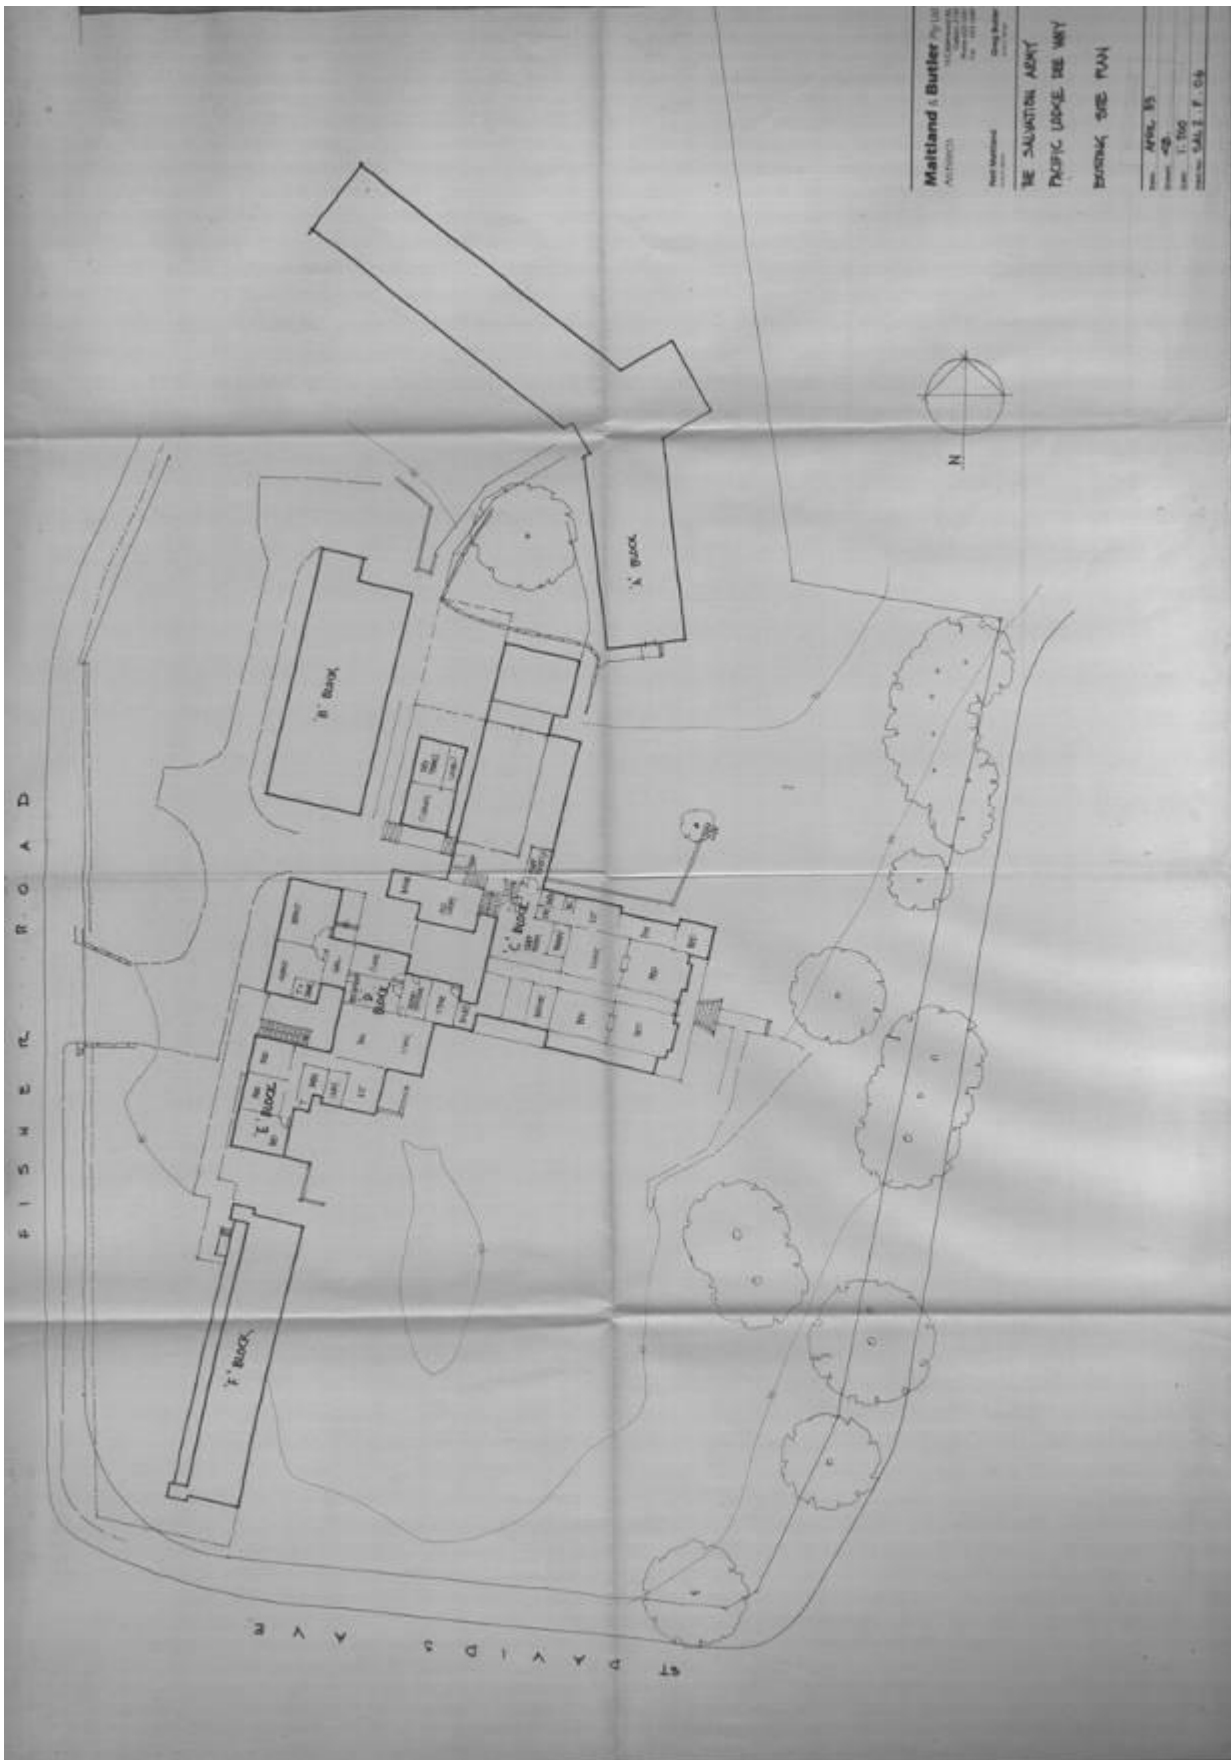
This site plan dated 1989 probably shows the layout of Pacific Lodge from 1962. Source: Salvation Army Drawing 890400 (Original drawing by architects Maitland and Butler). N↑
